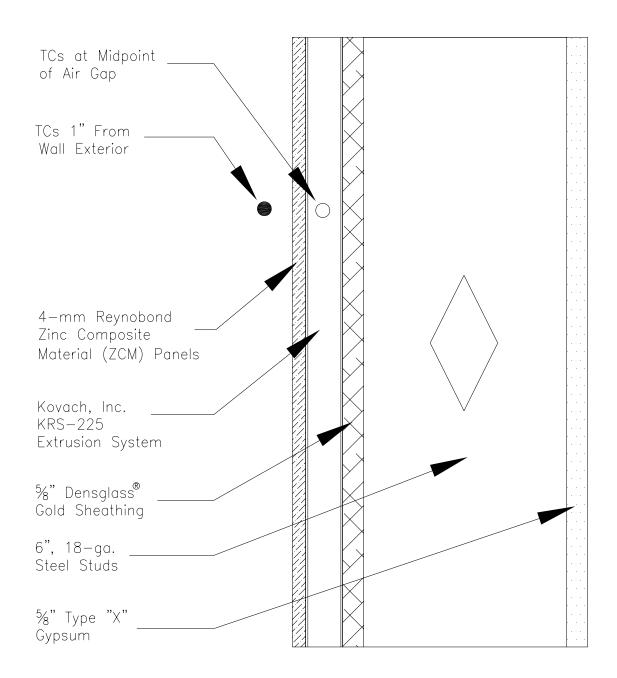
Instrumentation Arrangement – Profile View of System (Combustible Core, Air Cavity, and/or Insulation).
